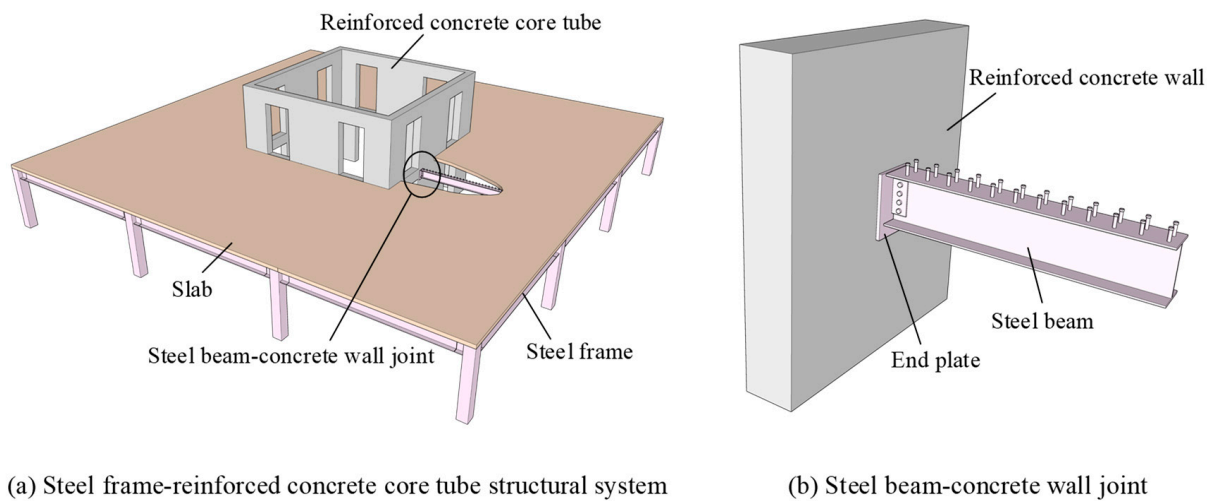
The SBCW joint in a steel frame-reinforced concrete core tube structural system.
